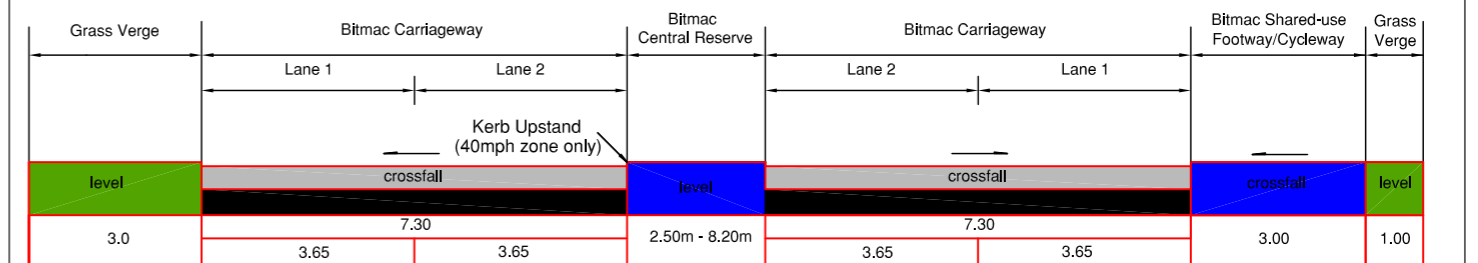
CROSS SECTIONS FOR A6MARR
